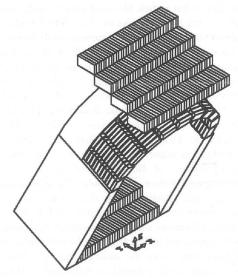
Tri-dimensional cross section of Pisani Villa staircase
